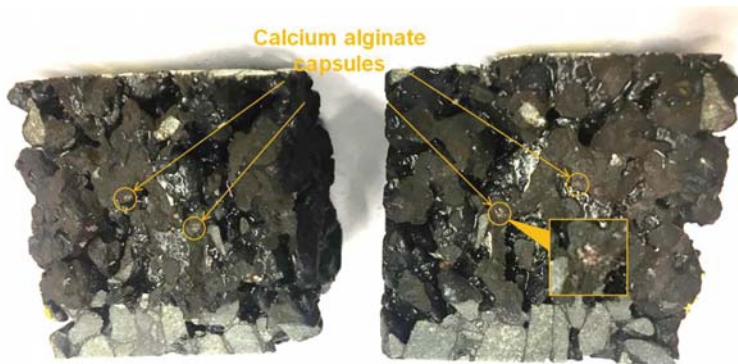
Fracture surface of a SCB specimen with 7% capsules.
